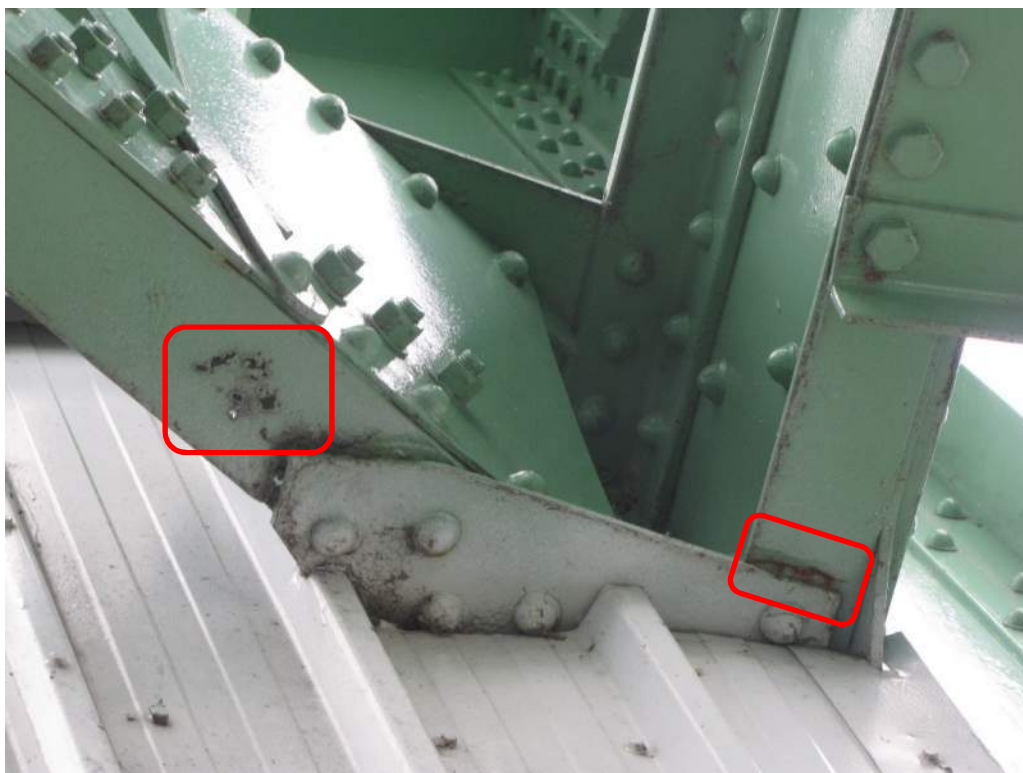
The northwest end of counterweight truss cross bracing 21S-27N has several perforations in the lower flange (left). Note the crack in the south lower flange of member 21N-27N (right).
